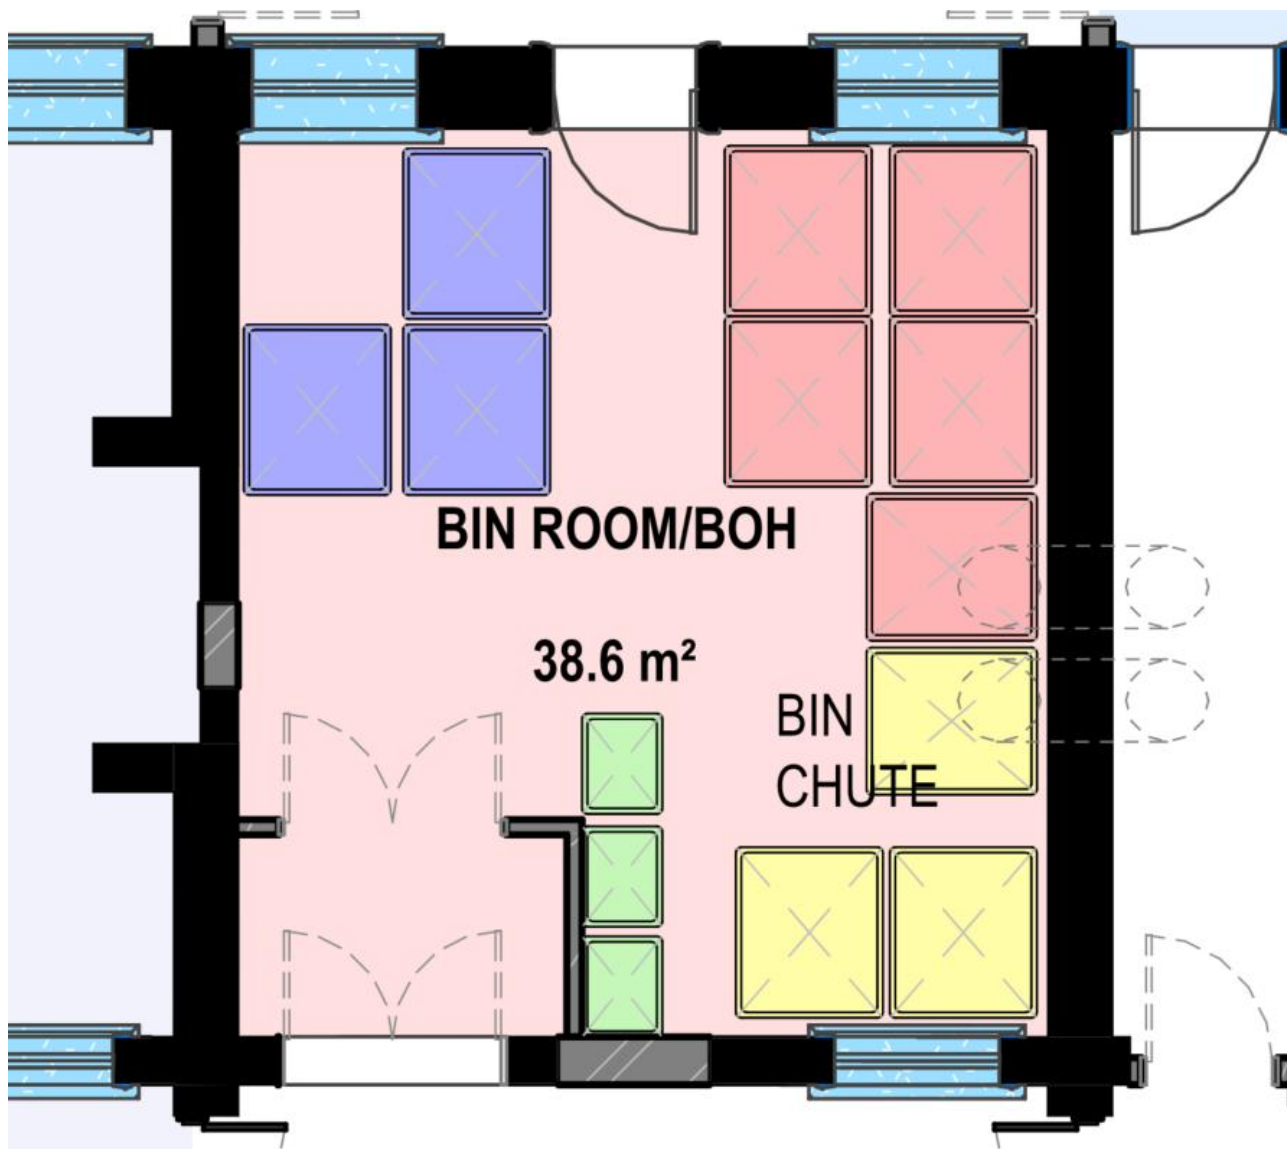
Bin Room Layout - Building A (Heritage - Commercial, Café)
